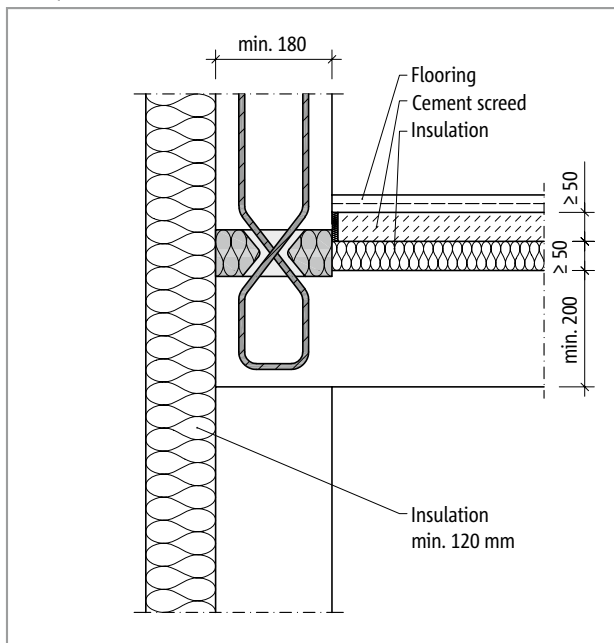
Schöck Sconnex® type W: R 30 / EI 0 with external wall and above-slab insulation without fire protection measures
